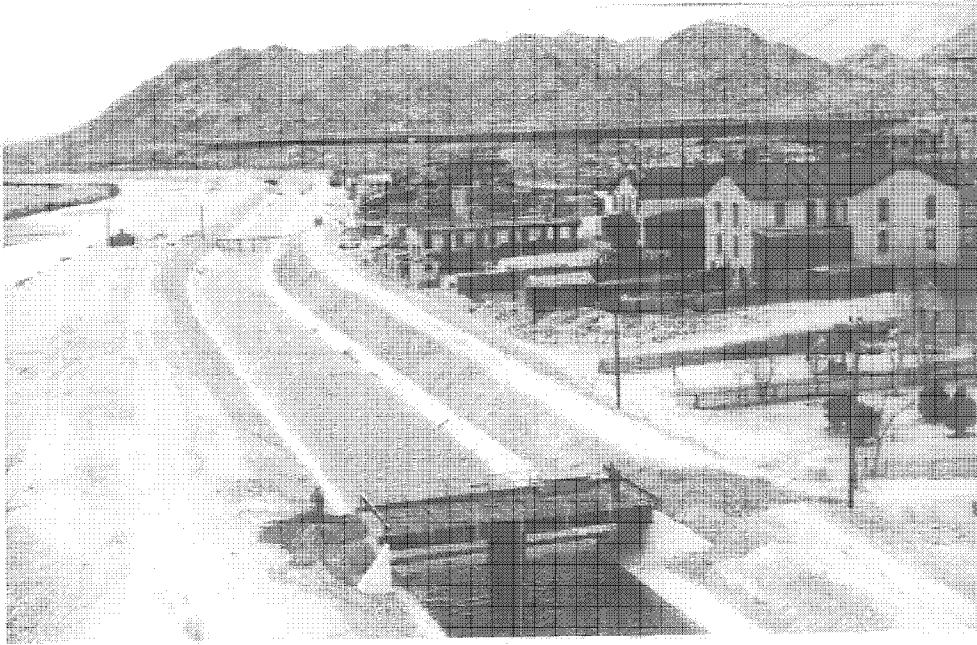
Lower Open Section "A" with Globe Street Bridge in Foreground, 12 March 1938.
